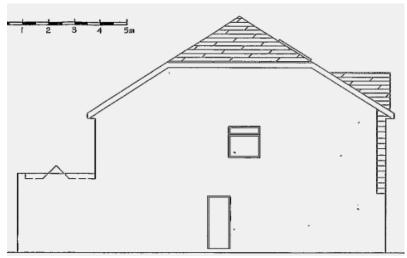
Refused side elevation drawing for planning application 15/01663/FUL.
